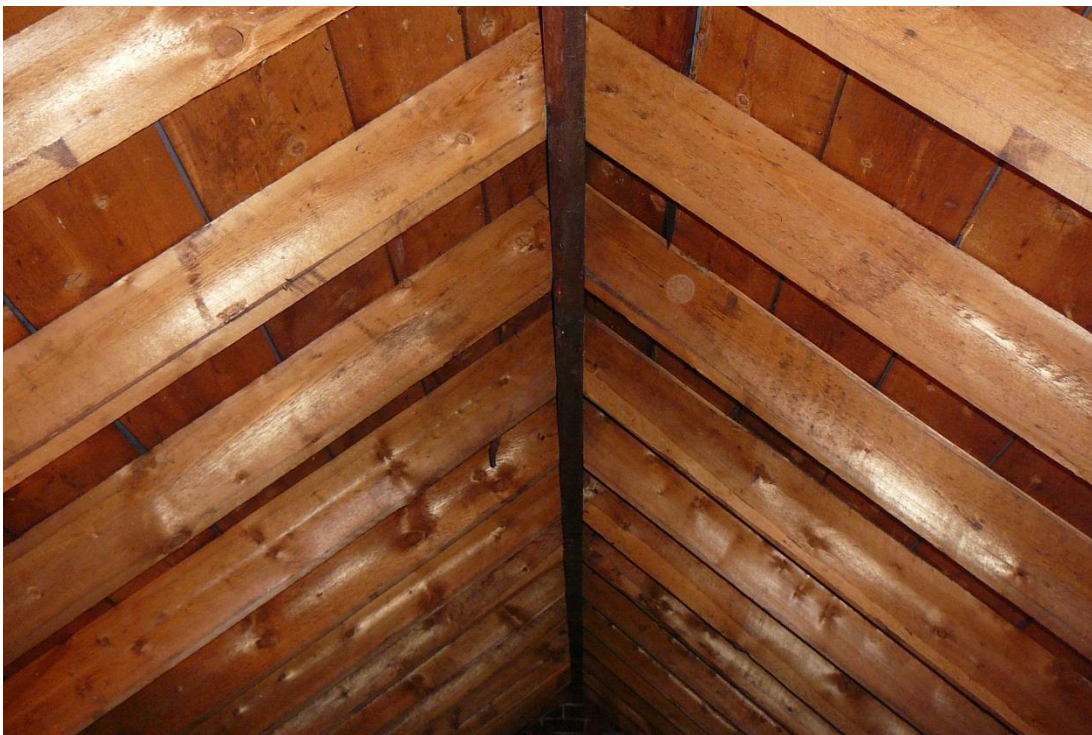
Attic floor roof structure, north rooms (A2/3), view up (Quinn 2017).
